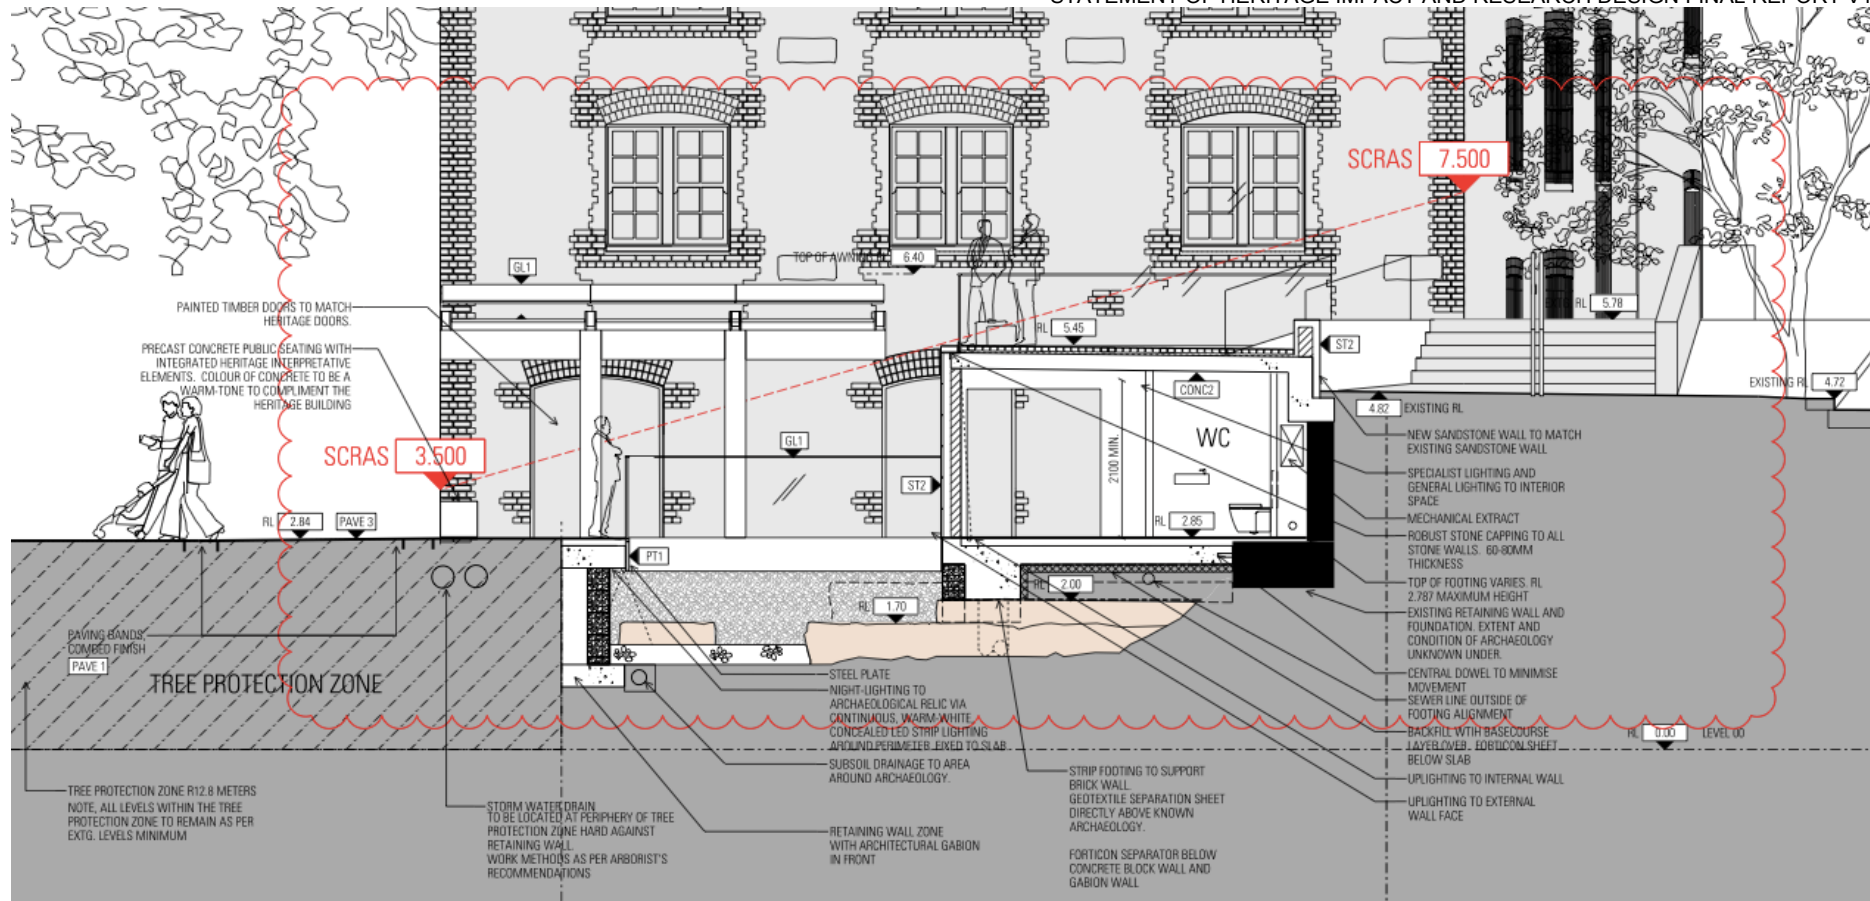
Bay 12 Redesign - South section through Level 1. (Detail from p30 JPW Design Statement)
